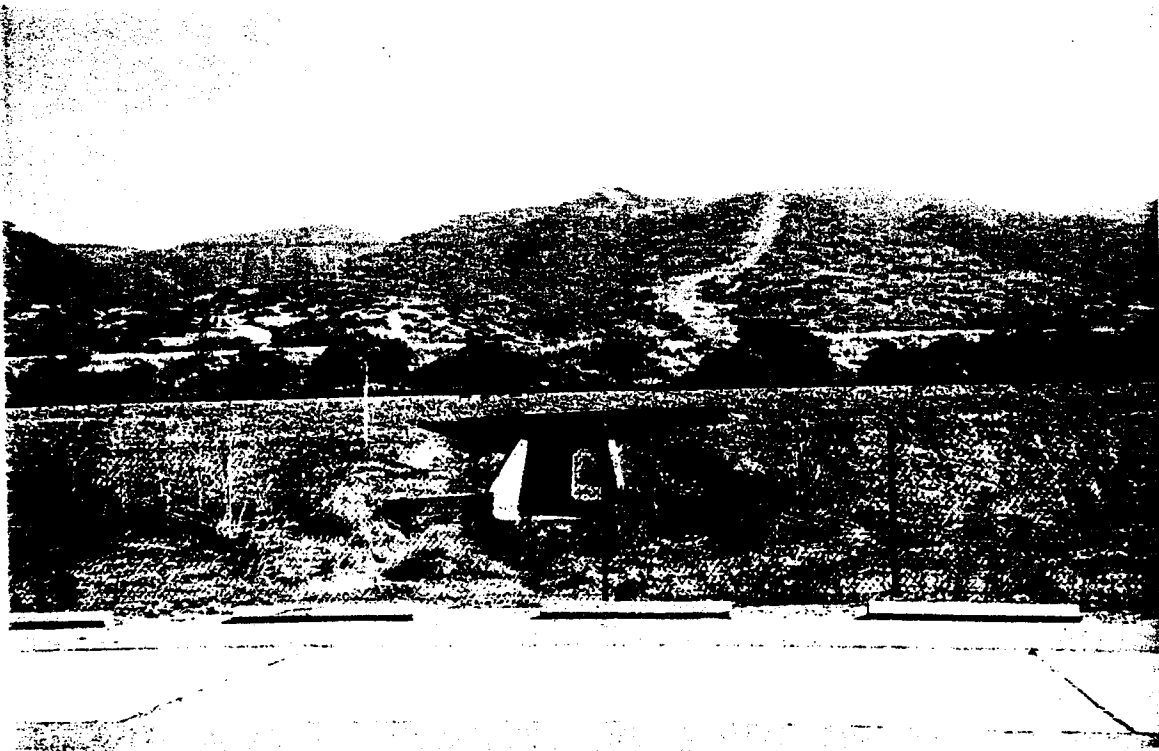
State Park parking spaces in the foreground, culvert 213.6 under rails in the center, coastal sage scrub and 1-5 in the background. Photo taken facing west and slightly to the north.
